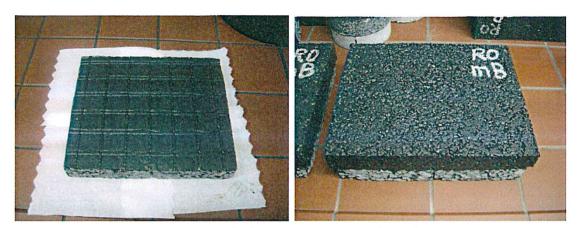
Pre cracked specimen with asphalt reinforcement
